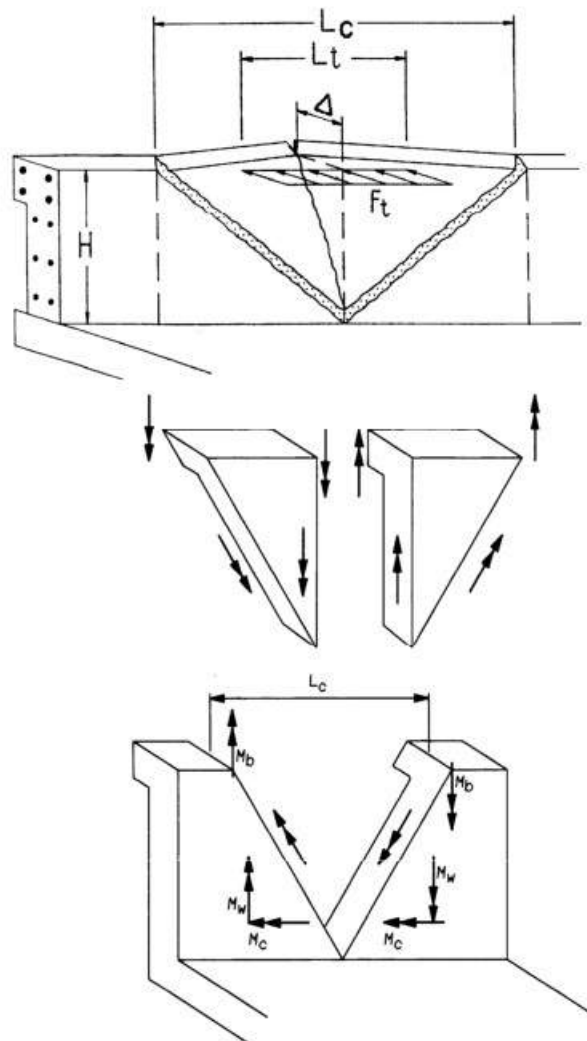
Yield Line Analysis of Concrete Parapet Walls for Impact within Wall Segment
